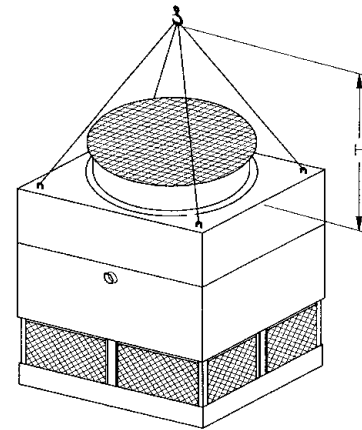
Fully Assembled Unit, Models UBT 8-56B through 8-912B.
